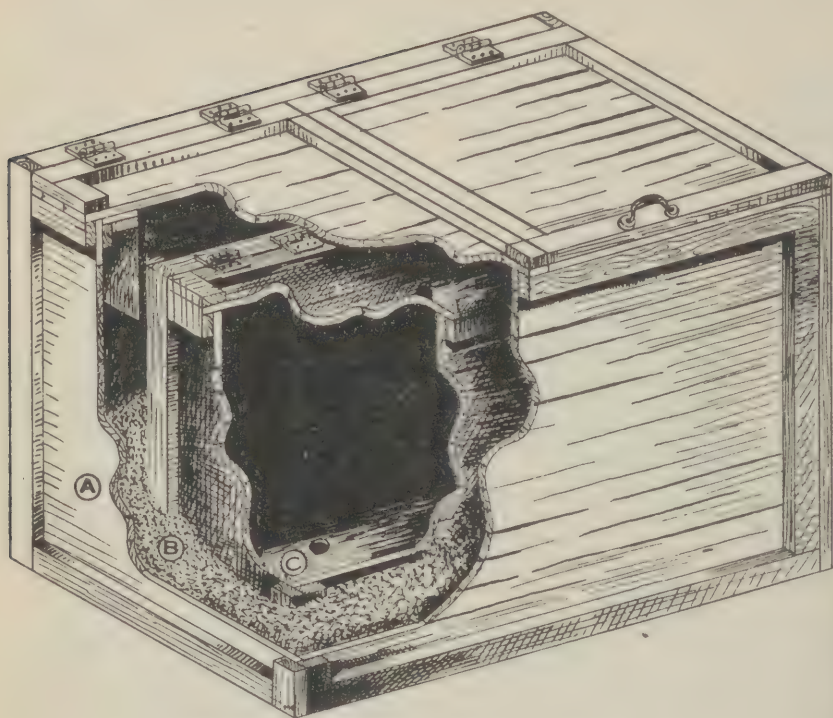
Underground ice or cooling box. A—Outer wall. B—Insulating material. C—Inner wall.
